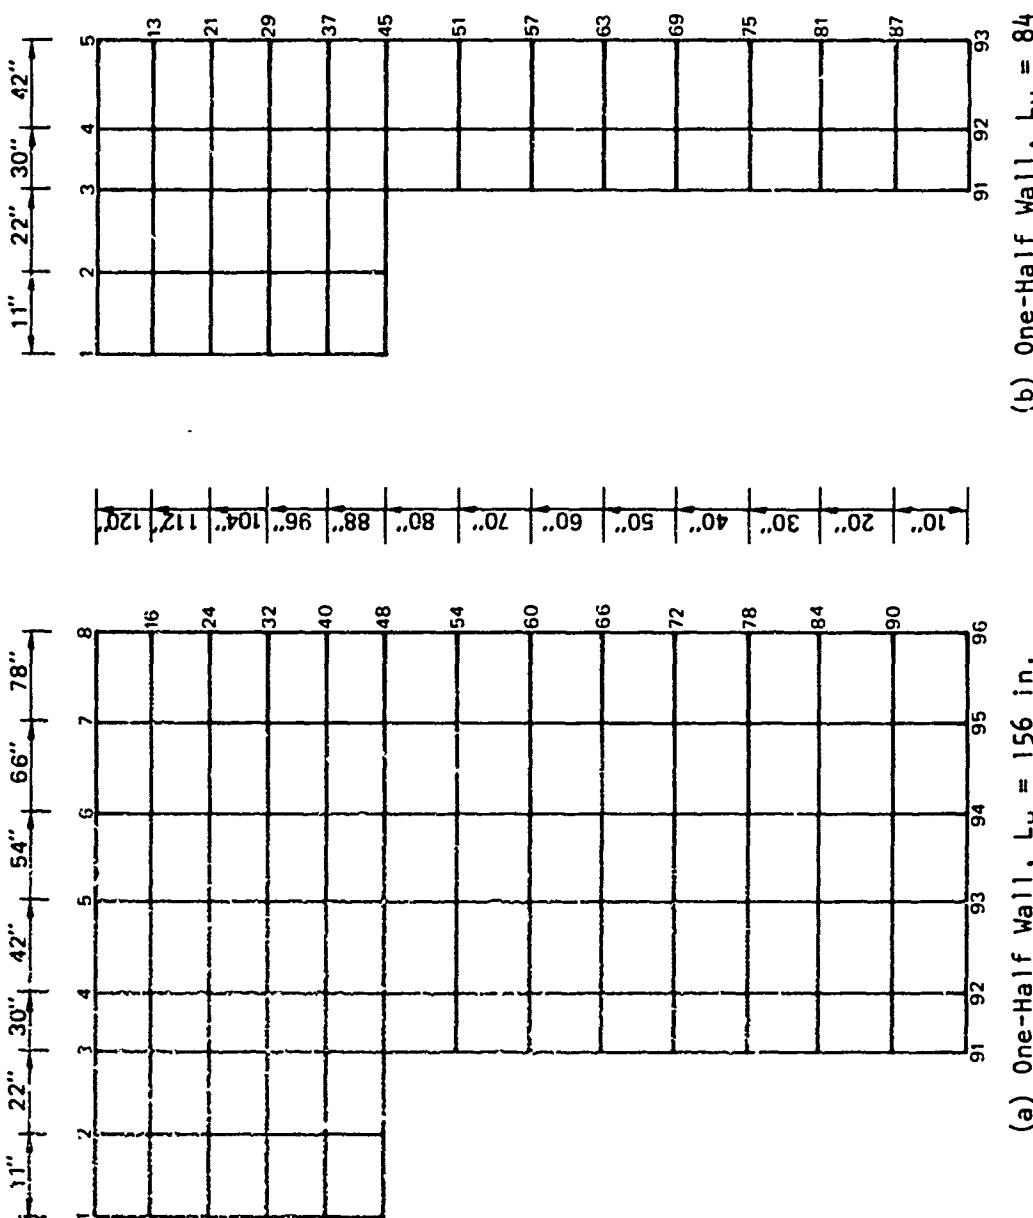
WALL WITH DOOR OPENING SHOWING FINITE PLATE ELEMENTS AND NODES
